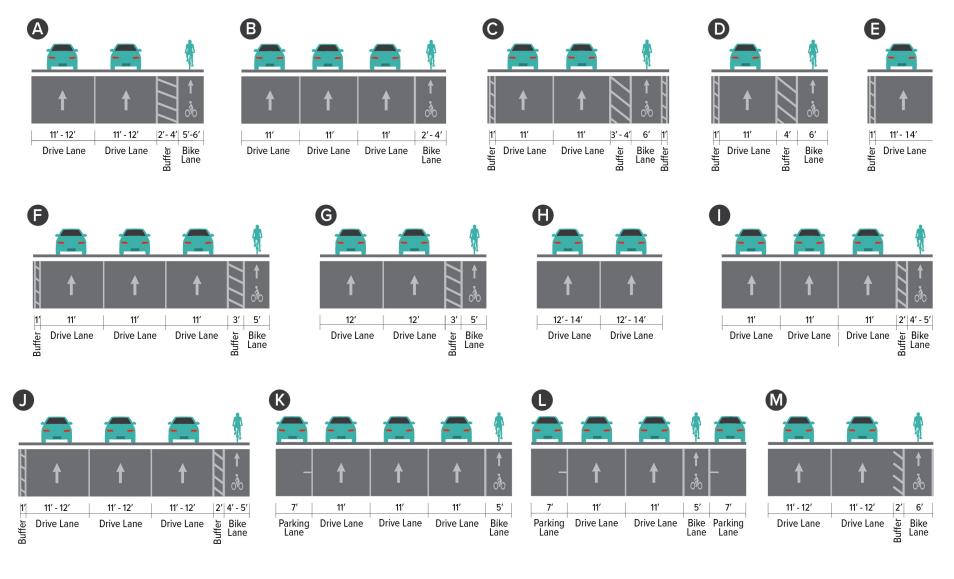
EXAMPLE CROSS SECTION CHANGES WITHIN EXISTING ROADWAY WIDTH
